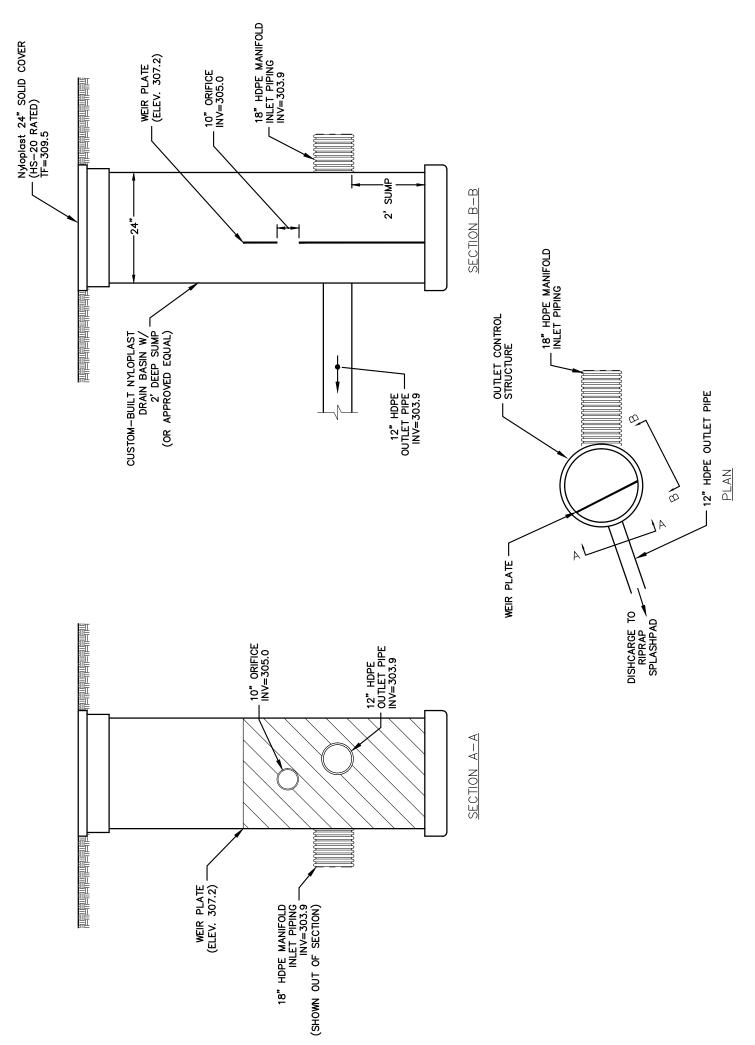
OUTLET CONTROL STRUCTURE AND PIPING DETAIL
